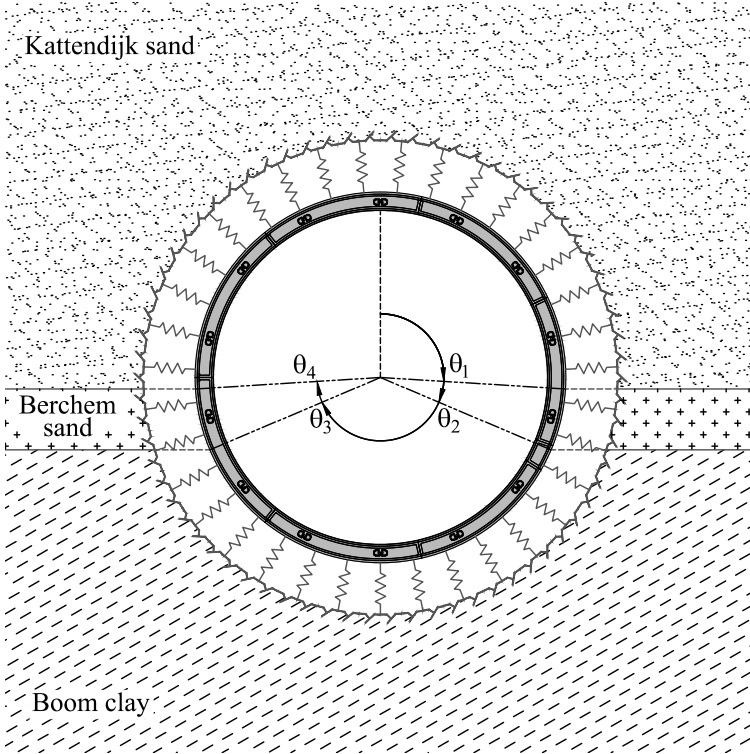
Example of a cross-section of the tunnel lining below River Scheldt with radial soil springs.
